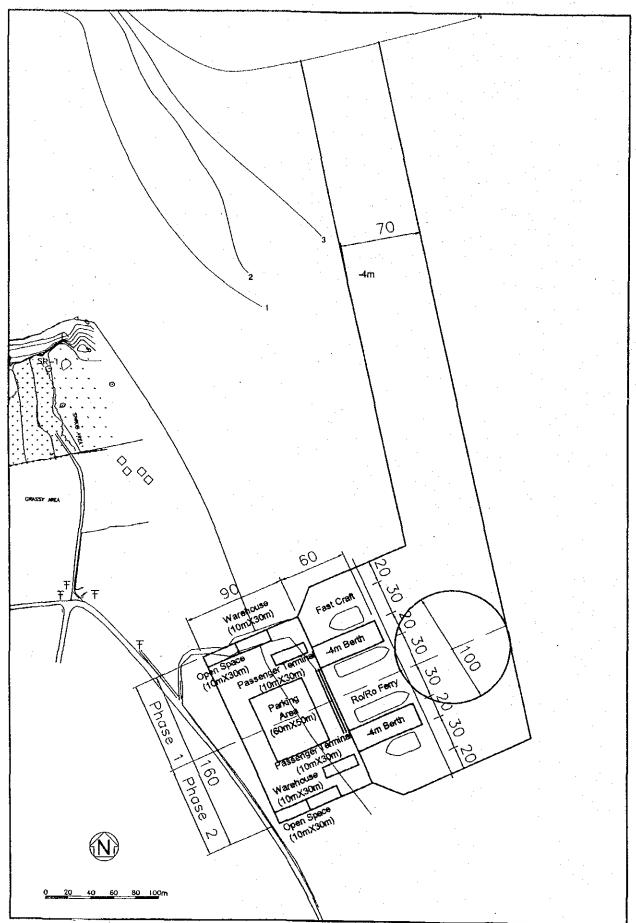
Master Plan of the New San Remigio Port 4-24
